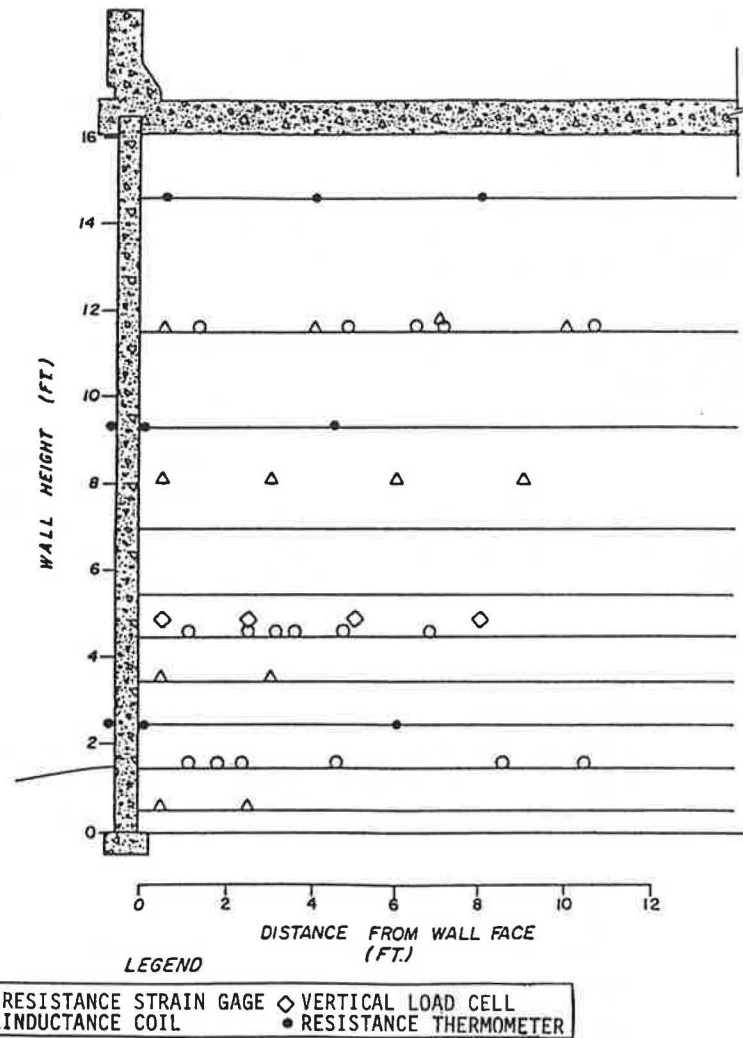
Schematic of instrumented earth reinforced retaining wall, Wall 26-32.
